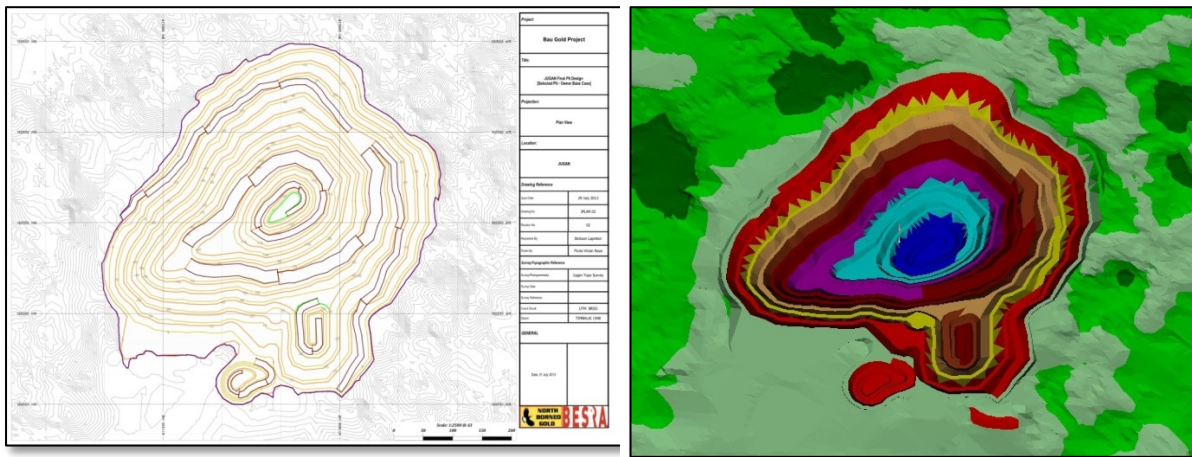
Jugan Detailed Pit Design - Plan & 3D View
